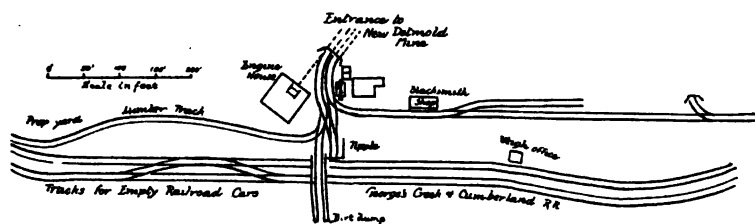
Sketch showing Track Arrangement, New Detmold Mine, Maryland Coal Company.
